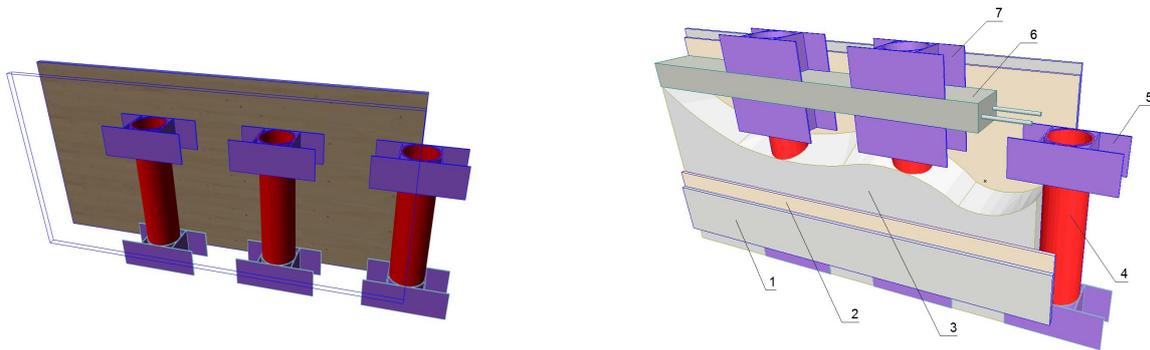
General view of a universal wall panel: on the left – a wall panel with plastic tubes (to be filled with concrete); on the right – a wall panel filled with concrete: 1 – interior finishing; 2 – an internal layer of OSB; 3 – heat insulation with precast foam concrete; 4 – a PTCC column; 5 – an intermediate element; 6 – a horizontal reinforcement frame in each tier of panels (made of precast heavyweight concrete); 7 – an intermediate element of the overlying tier of panels.
